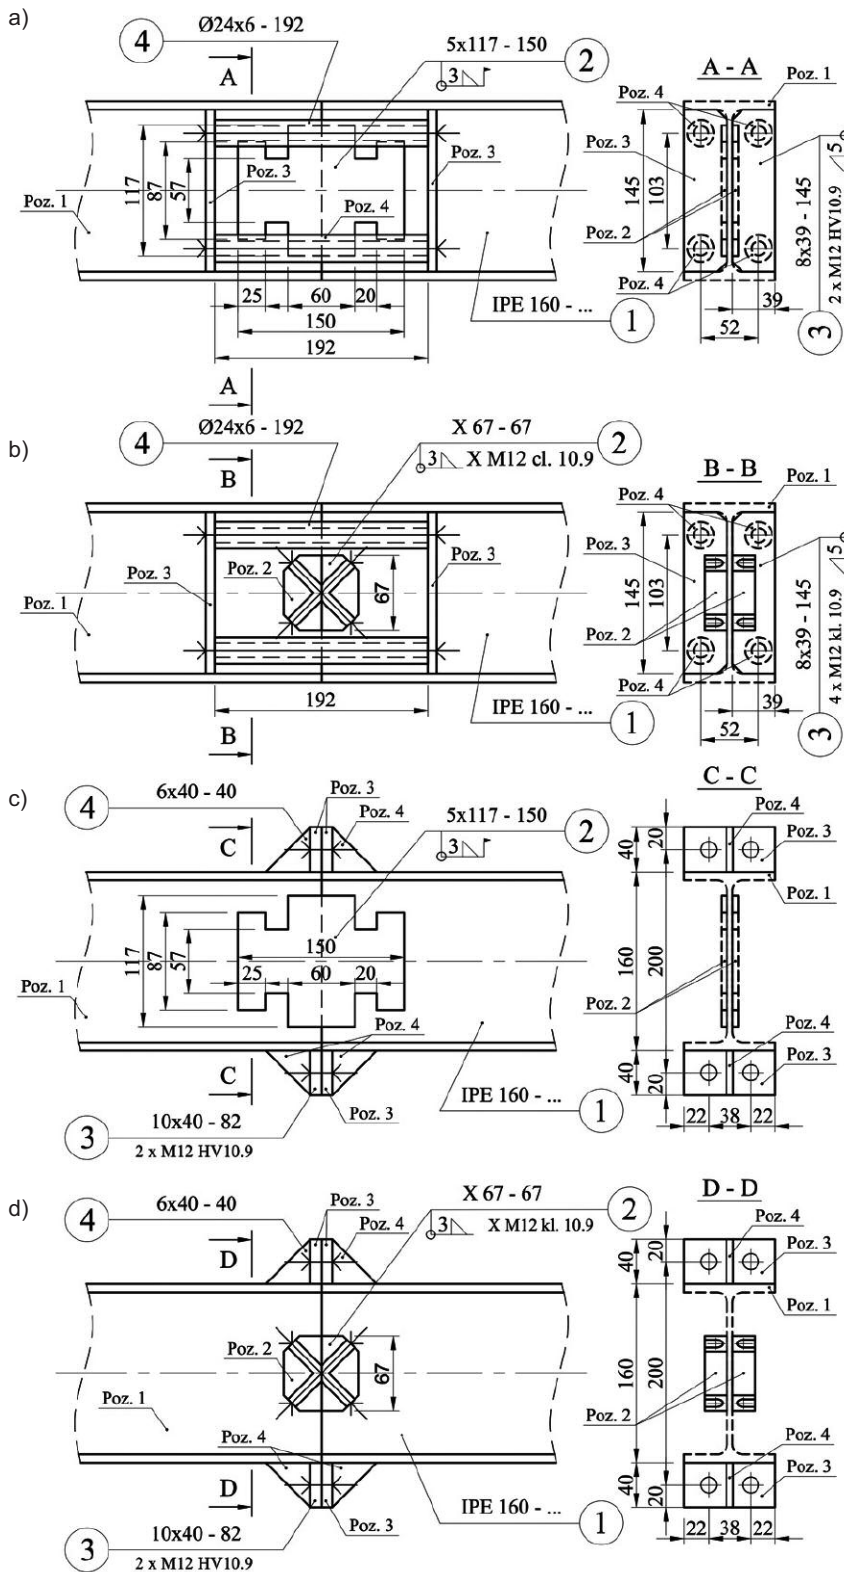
Diagrams of the developed modified connections [mm]: a) partially welded with bolts inside the cross-section; b) with a cross-bolt on the web and bolts inside the cross-section; c) partially welded with bolts extending beyond the cross-section; d) with a cross-bolt on the web and bolts extended beyond the cross-section
